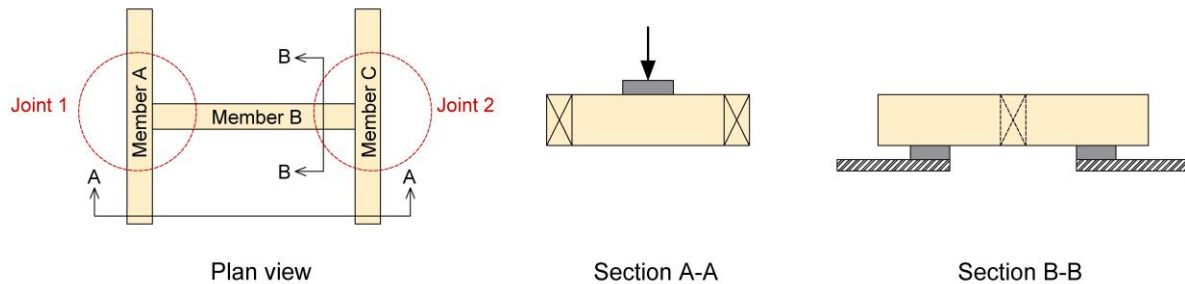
H-type assembly for test specimen, maximum sample size from a single test is two (n=2)
